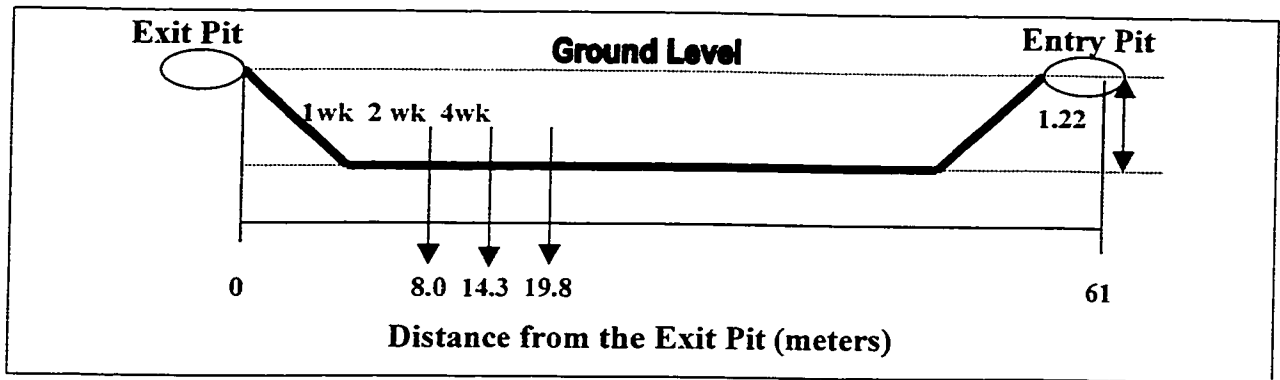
Elevation View of the 300mm Pipe Installation in Sand
